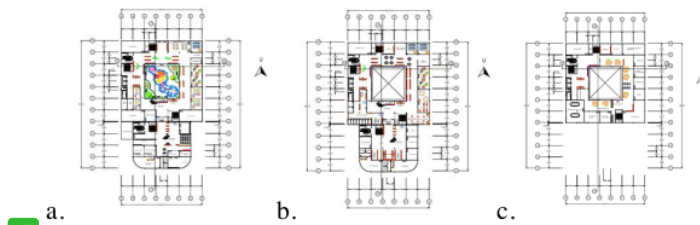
a. First Floor; b. Second Floor; c. Third Floor (Pribadi, 2024)
